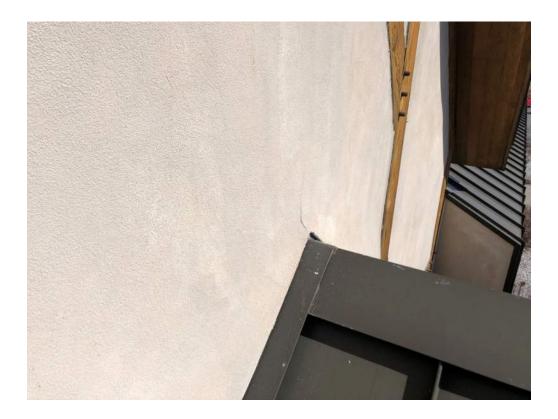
Porte Cochere column with cracked stone cladding.
